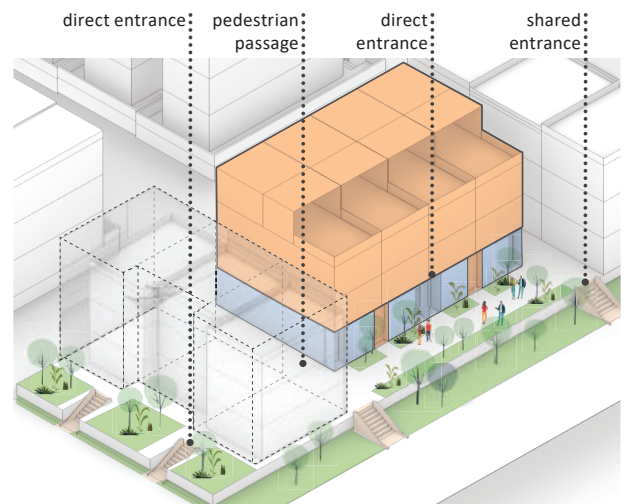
BUILDING ENTRY EXAMPLE
